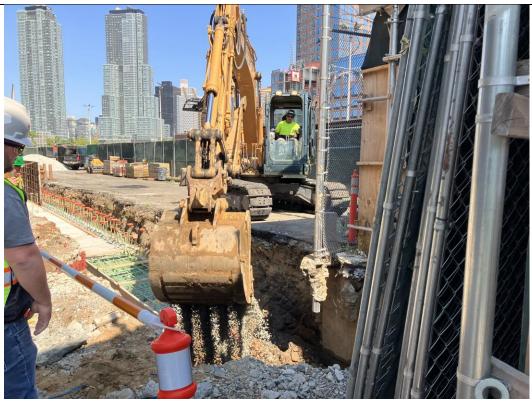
View of Let It Grow compacting the 0.75-inch stone backfill (facing south).
